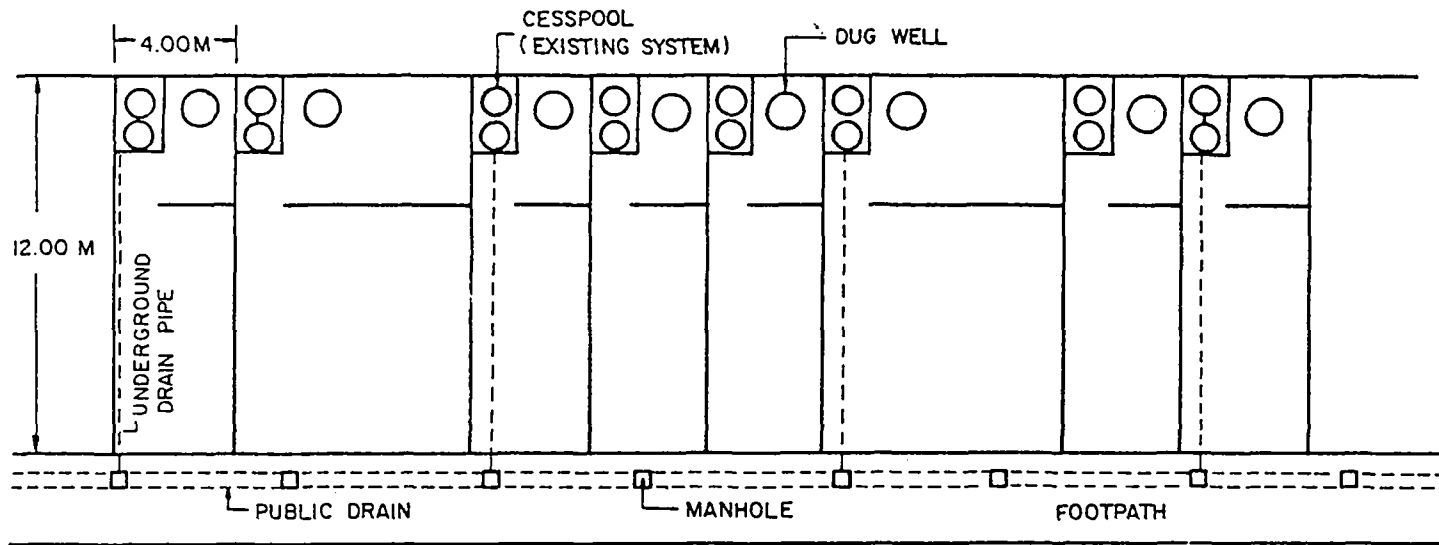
Typical Layout of Rowhouse with Drainage of Cesspool System Overflow to Public Drain
